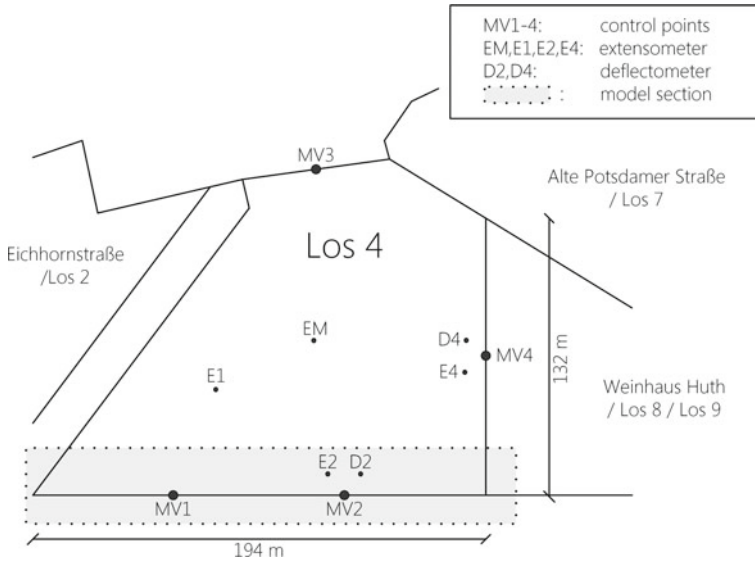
Ground plan of instrumented Debris excavation section (Los 4) with control points and marked model section, cf. [11]
